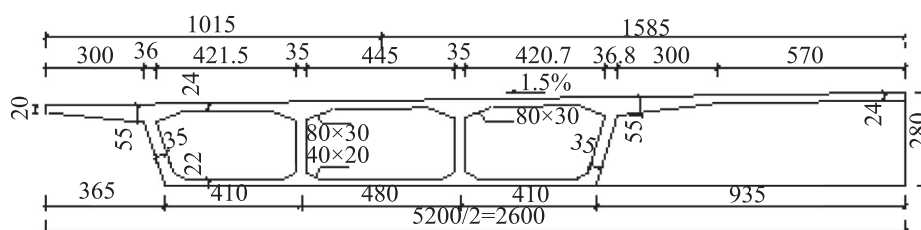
Layout of semi-section and small girder division (G1, G2, G3 and G4) (unit: cm).
